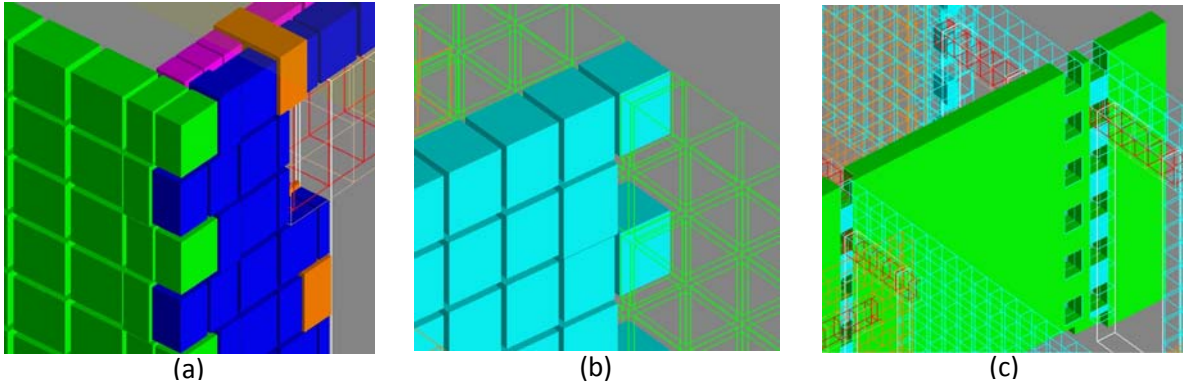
Images of interlocked wall junctions a) between the front facade and a party wall, b) between an internal wall and a party wall, c) between the internal walls framing into the common party wall in a two- or three-building control numerical model.
